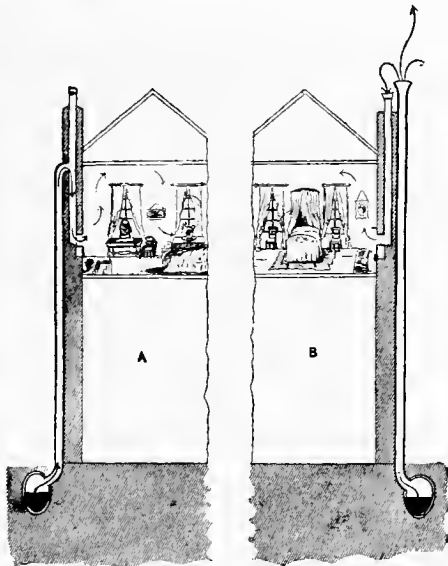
A, Ventilating pipe of drain turned into bedroom chimney. B, Ventilator of drain discharging close to a chimney pot.
